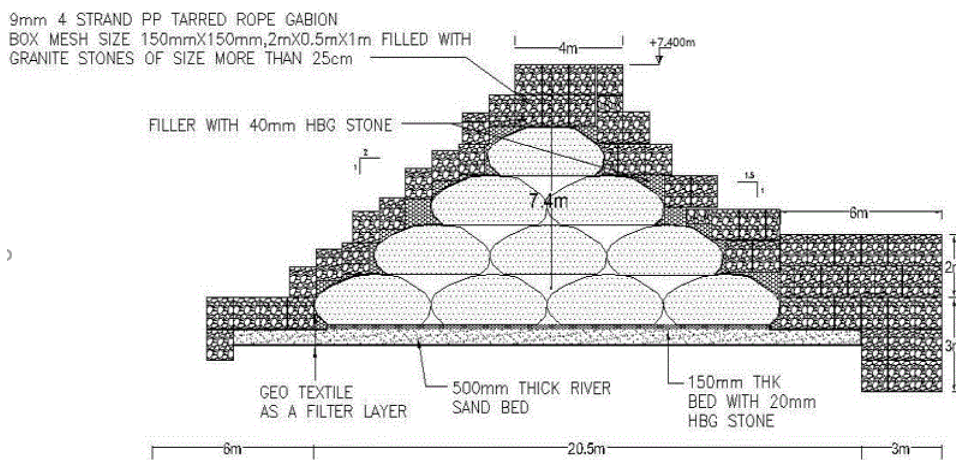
Typical cross-sections of geotextile tube embankment (All dimensions are in m)
